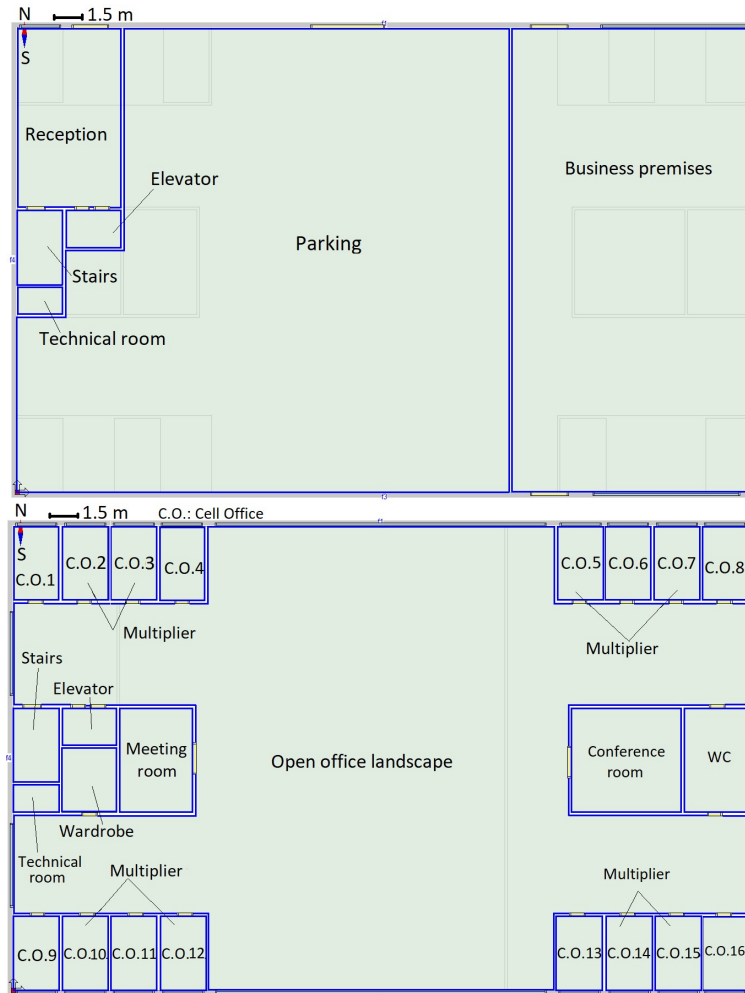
Generic ground floor plan, the first floor plan (top), and the second and the third floor plans at level 3.4 m and 6.8 m (bottom) with thermal zones
